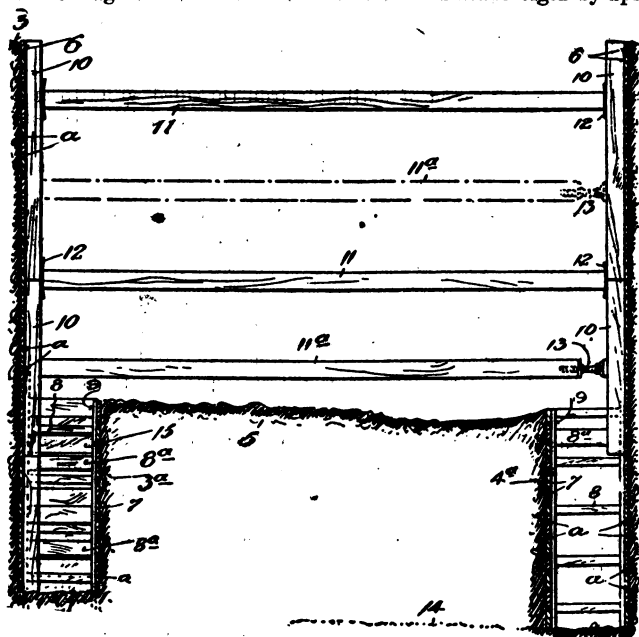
Typical Section Showing Method of Excavating Deep Cuts with Vertical Sides.
